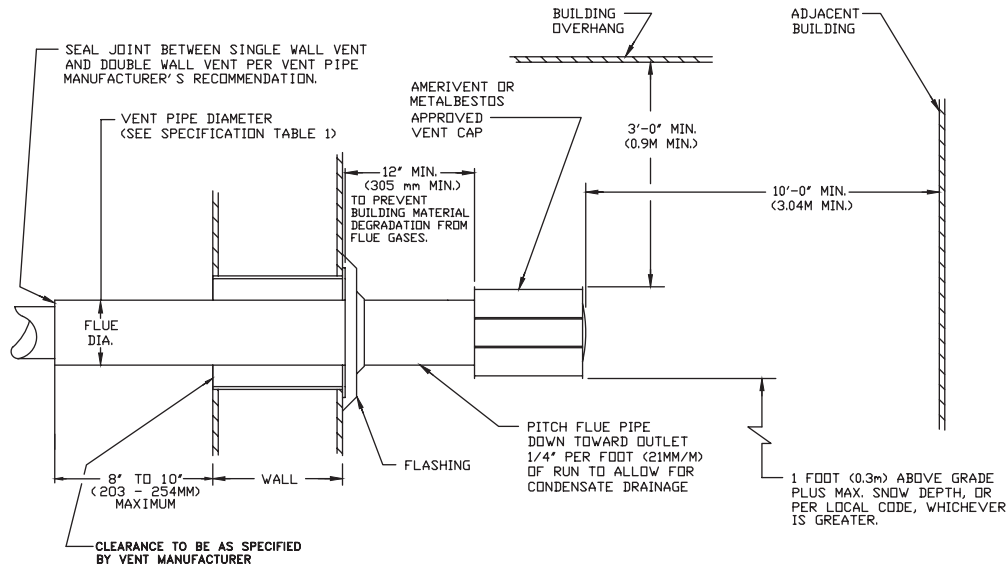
A – Horizontal Arrangement – Single Wall Vent System to Double Wall Termination
